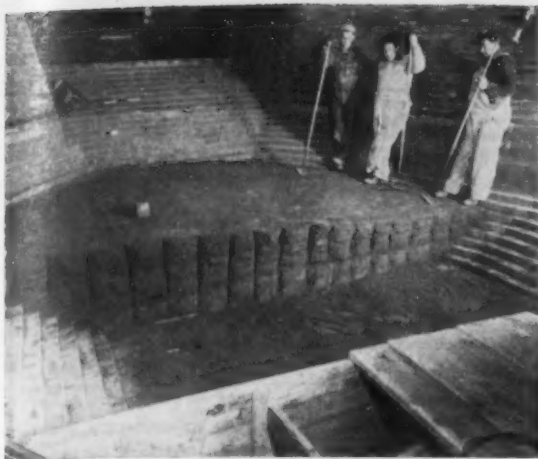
Forms have been removed from end section. The heavy scoring was done by pick to assure firm bond at joint.
